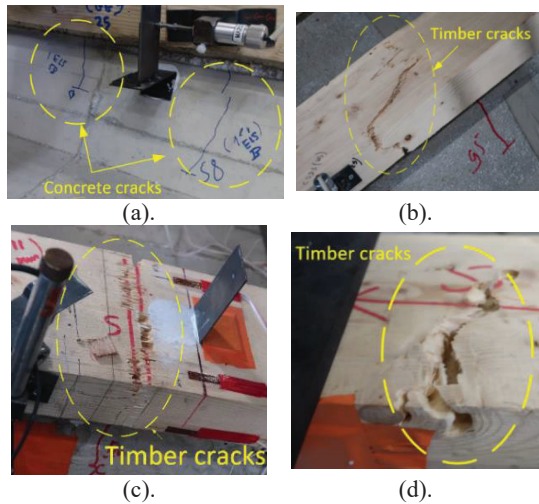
(a). Cracks in concrete drop. (b). Failure of F_1 . (c). Failure of F_2 . (d). Failure of F_3 .
